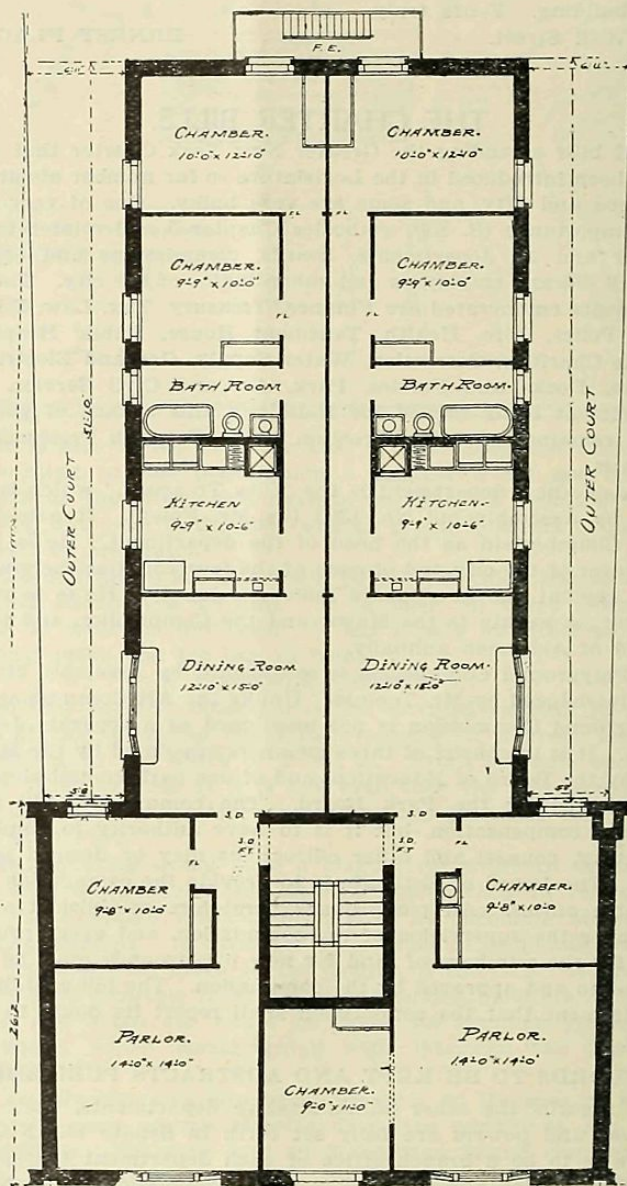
FLOOR PLAN OF HOUSE IN KELLY STREET.
